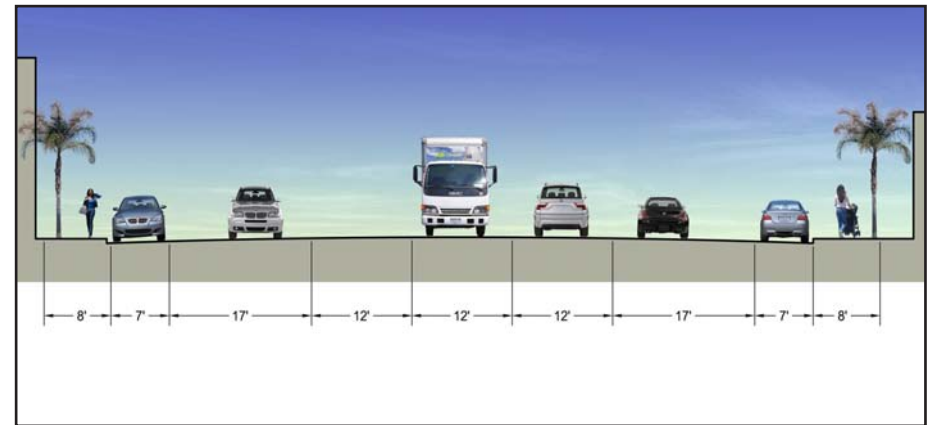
Cross section of the existing Santa Anita Avenue from Merced to Tyler.
